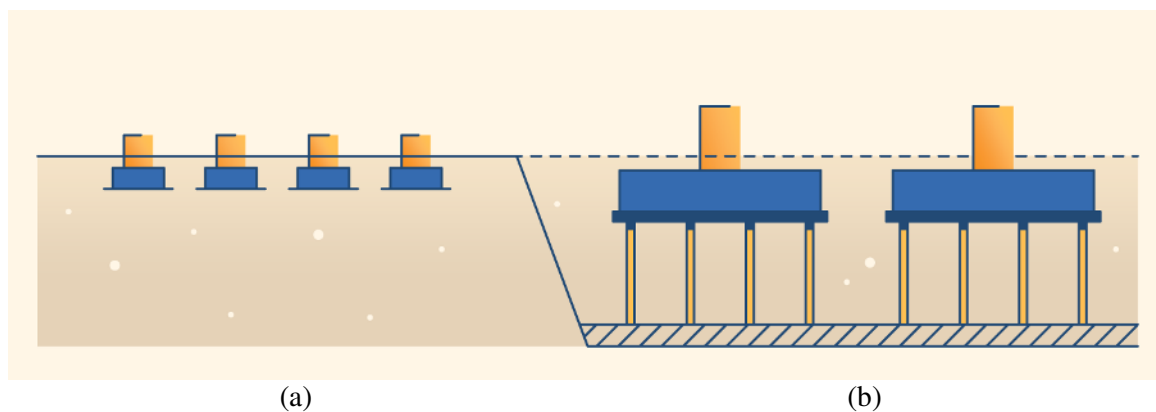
Types of foundation, (a) shallow foundation, and (b) deep foundation
